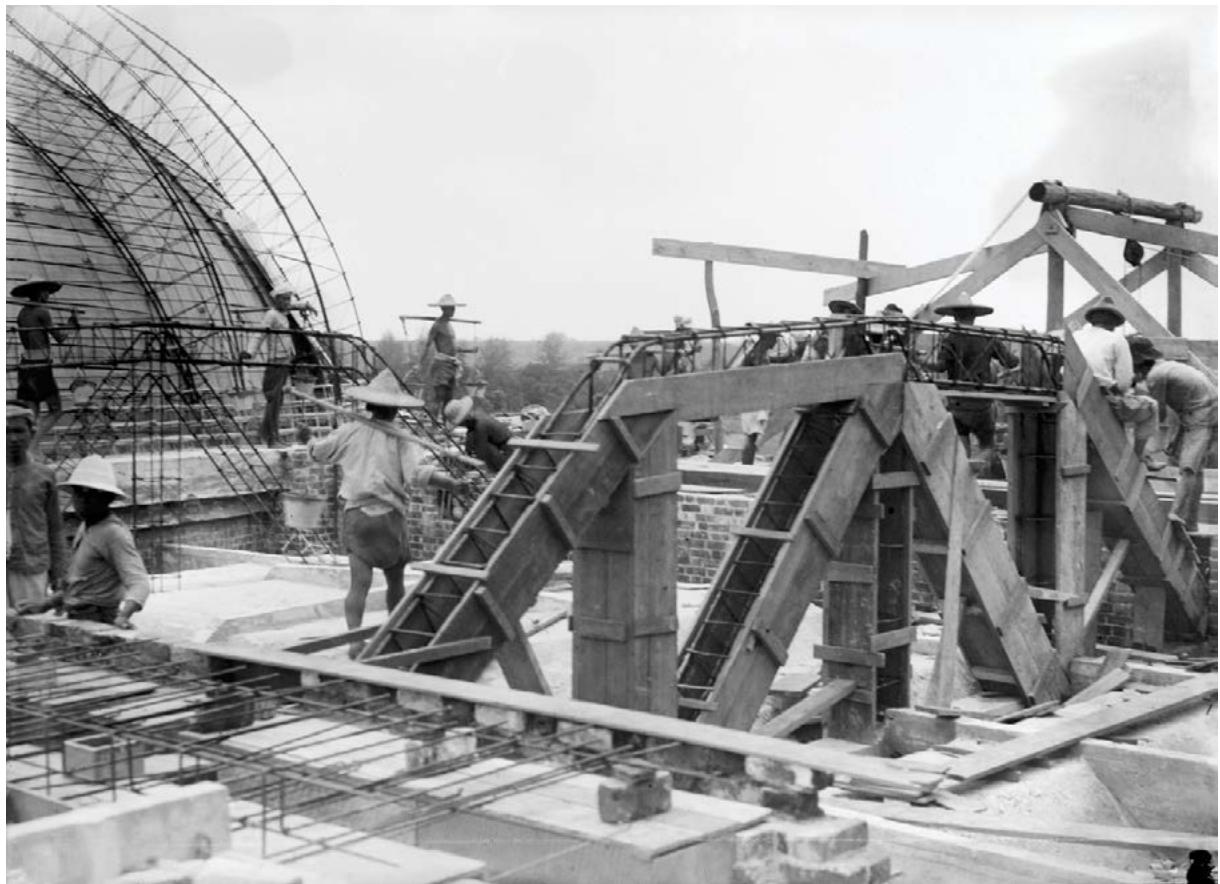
Reinforced concrete work at the Ananta Samakhom Throne Hall, 1910.
